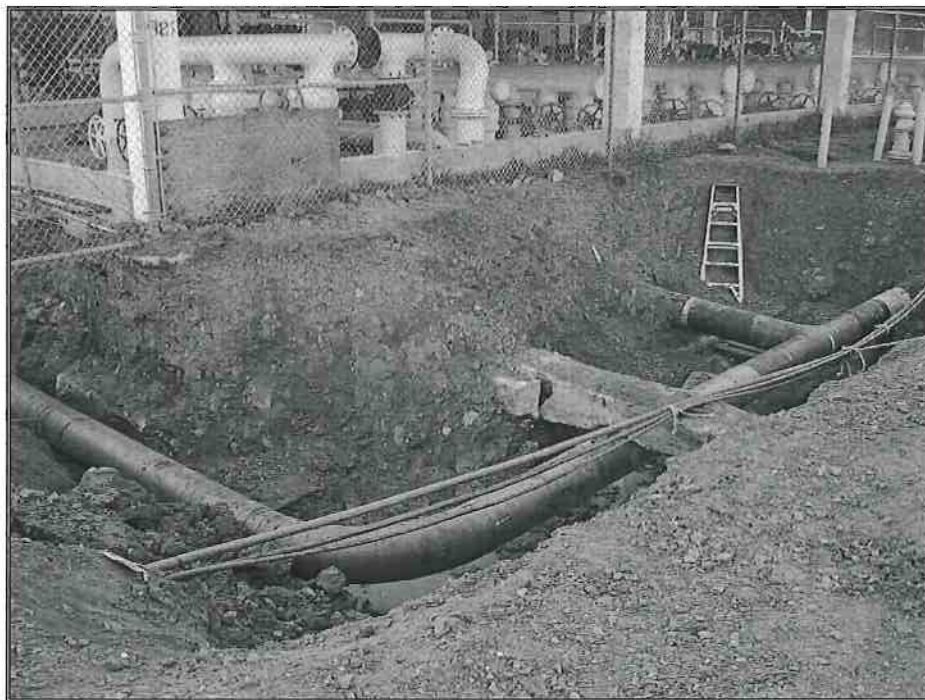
C – PH 1982 Pig Trap Installation JP-Pipeline
